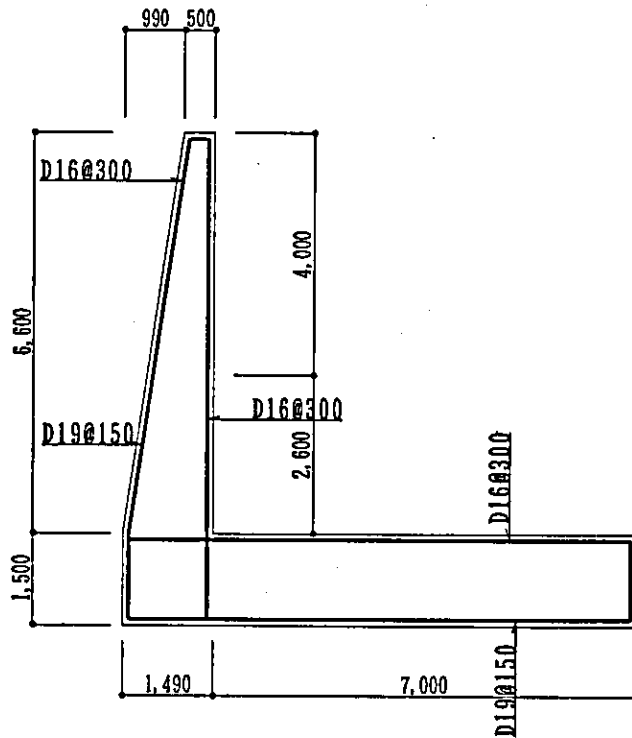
REINFORCEMENT ARRANGEMENT
